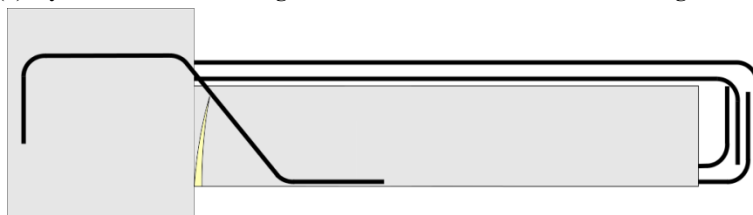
Concrete ingress between upper and lower bottom longitudinal reinforcement.
